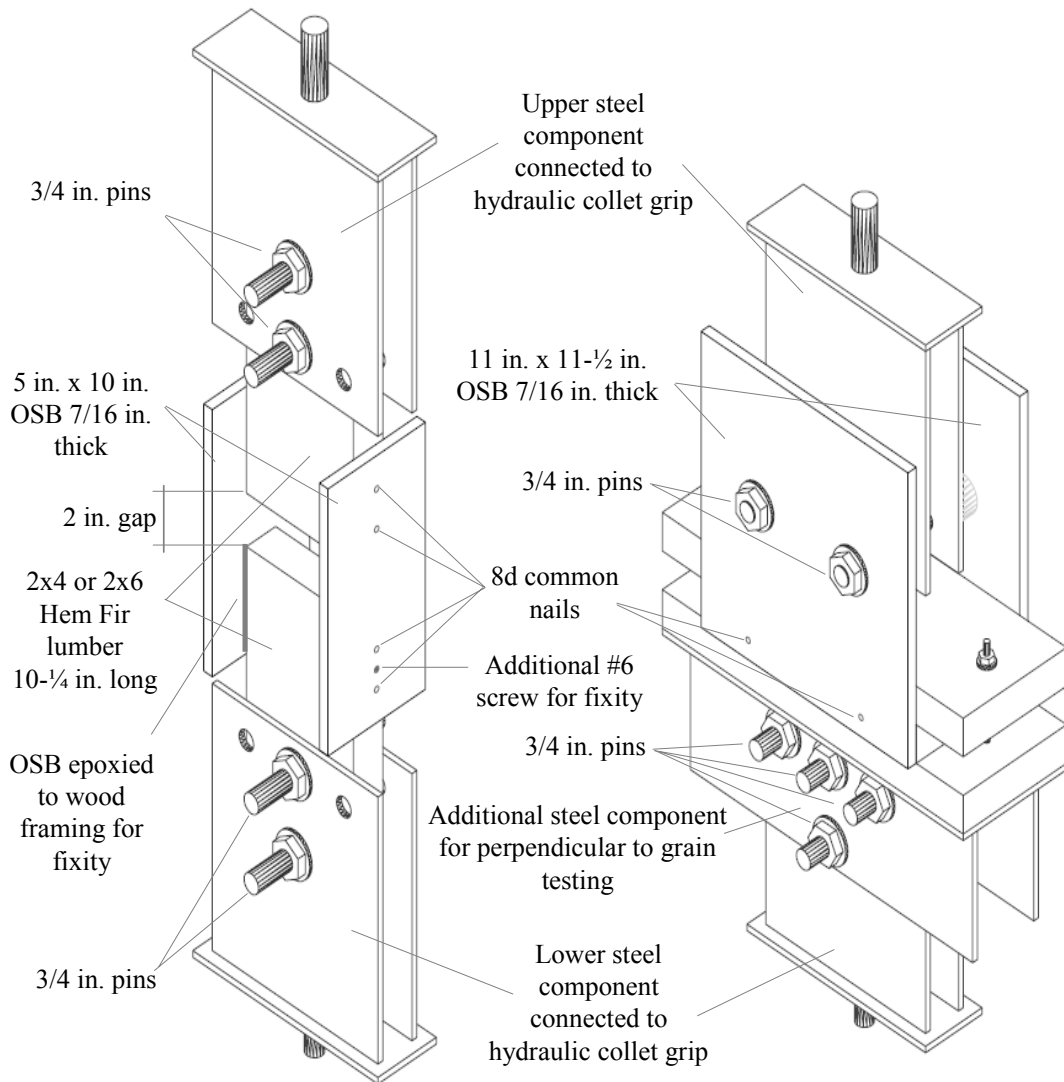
Test apparatus and specimen dimensions for testing parallel to grain (left) and perpendicular to grain (right)
